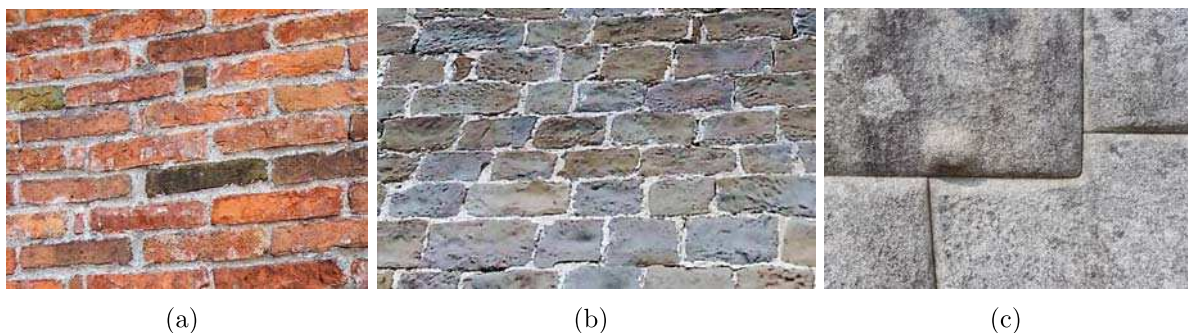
Examples of masonry: (a) brick masonry, (b) stone masonry and (c) Inca's masonry (dry stone masonry).
